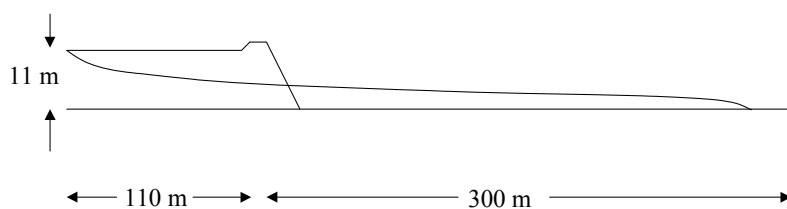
Central section of the failure at Gypsum Tailings impoundment
